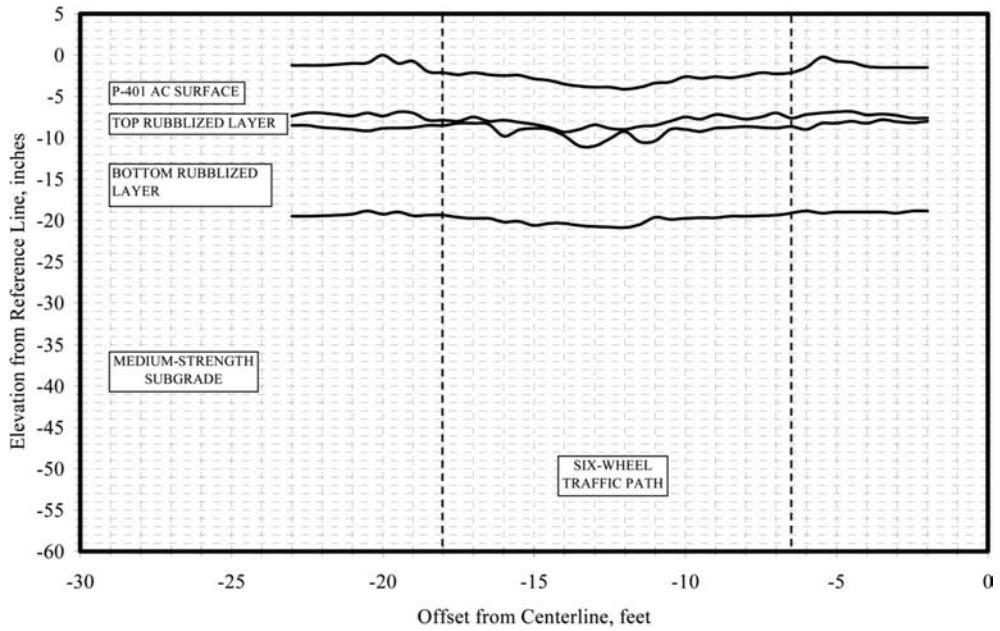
Pavement layer profiles from trenches in the MRG test section (1 in. = 25 mm).
